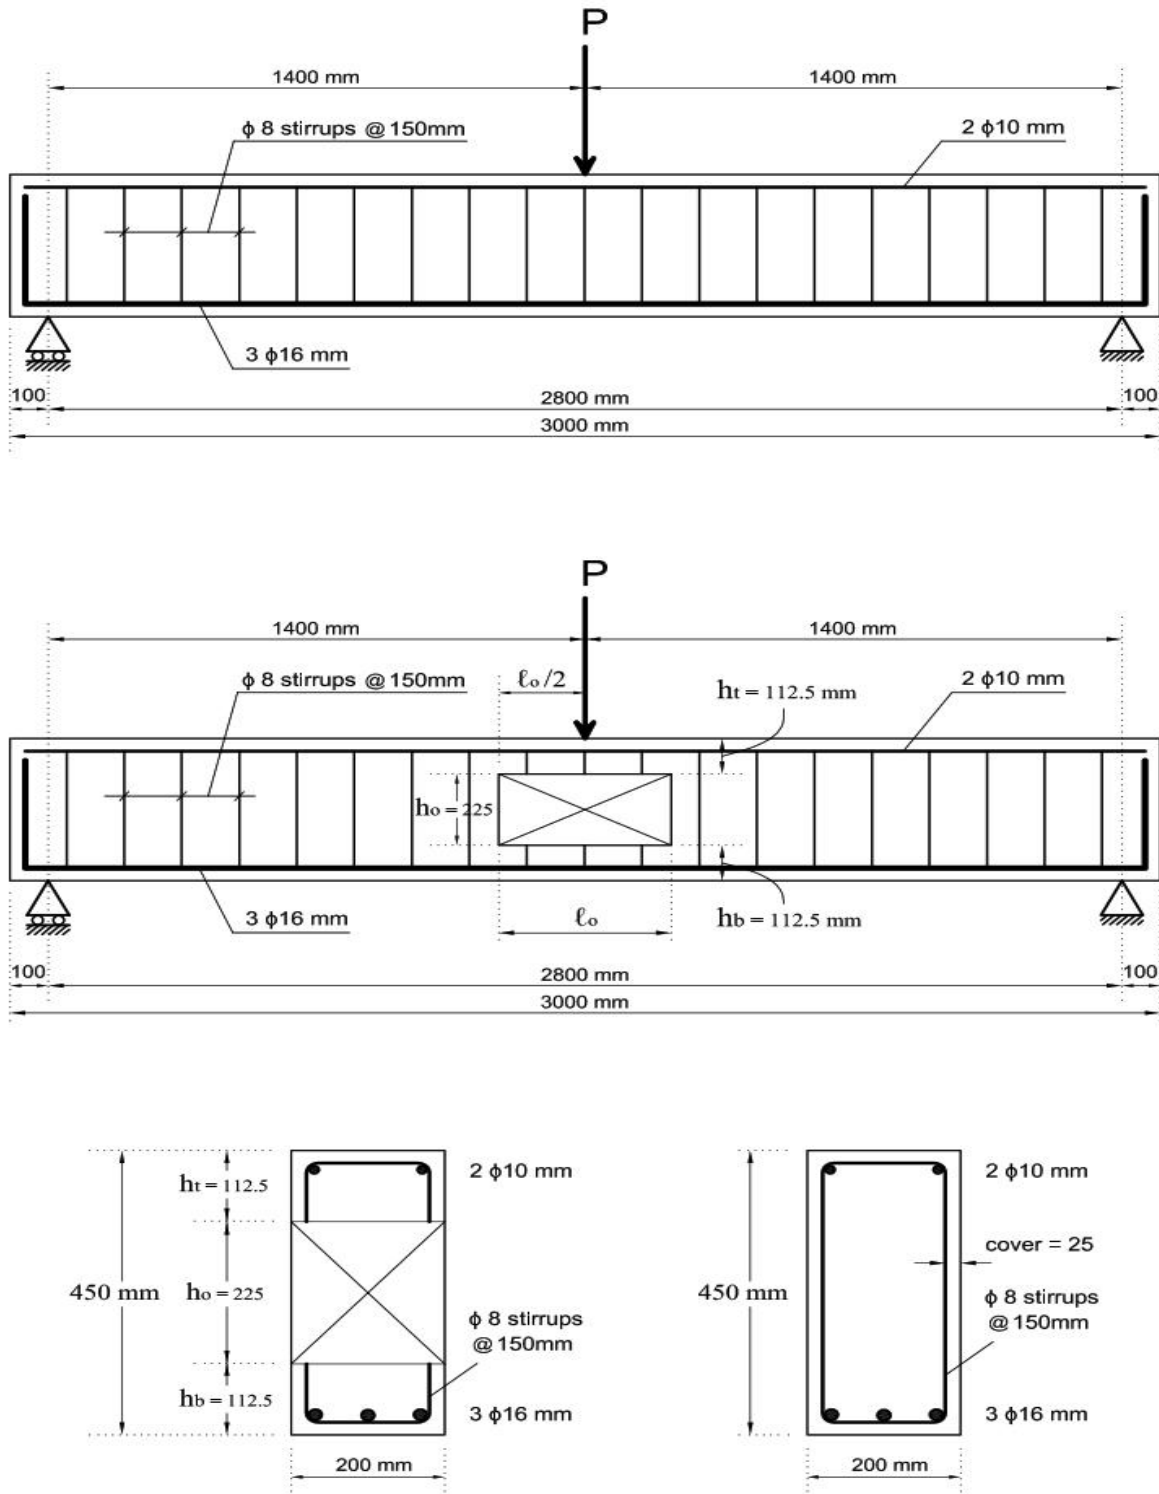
Details of unstrengthened beams with center-point loading: (a) elevation of beam without opening, (b) elevation of beam with an opening, (c) beam section within solid parts, (d) beam section within opening location.
